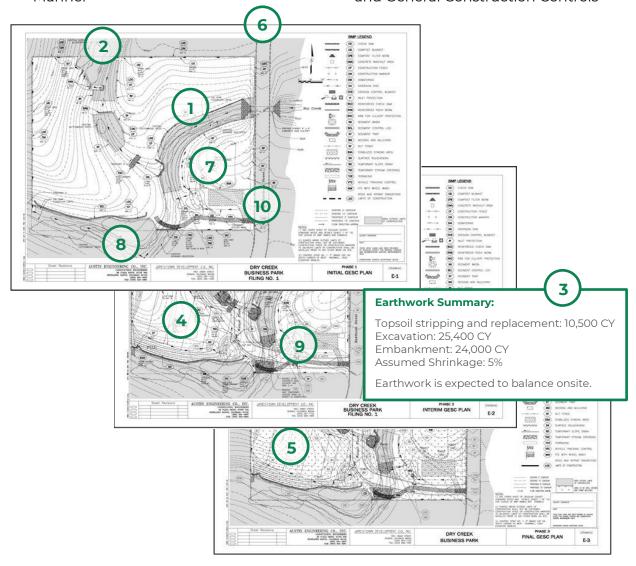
Ten Elements Related to Features on Example GESC Plans
